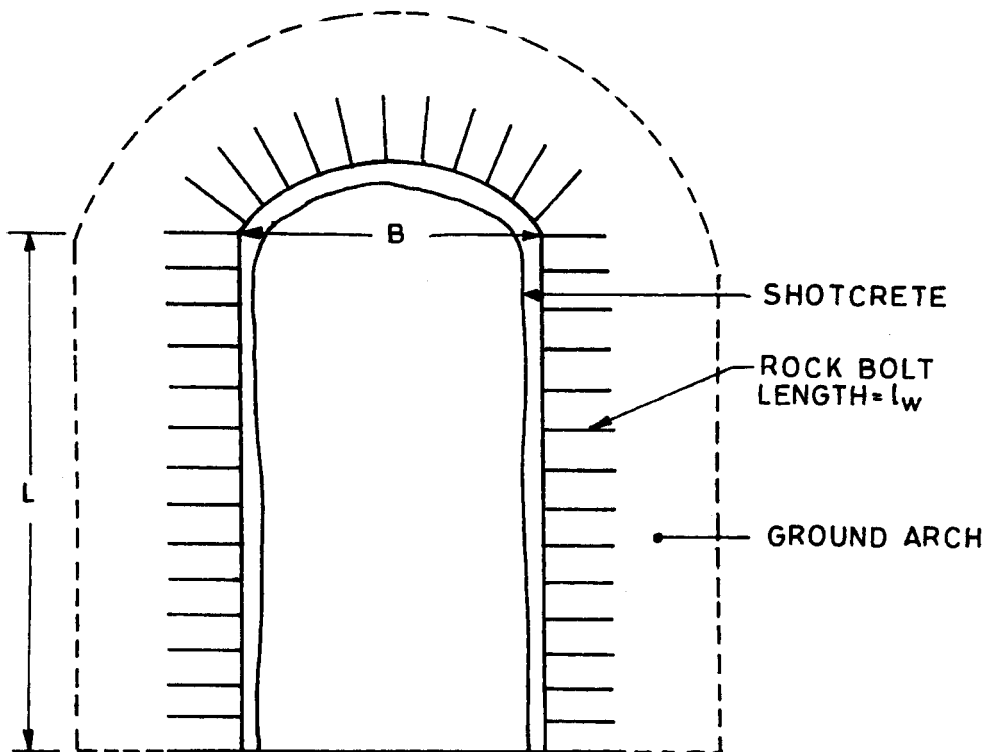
DESIGN OF WALL REINFORCEMENT OF CAVERNS
